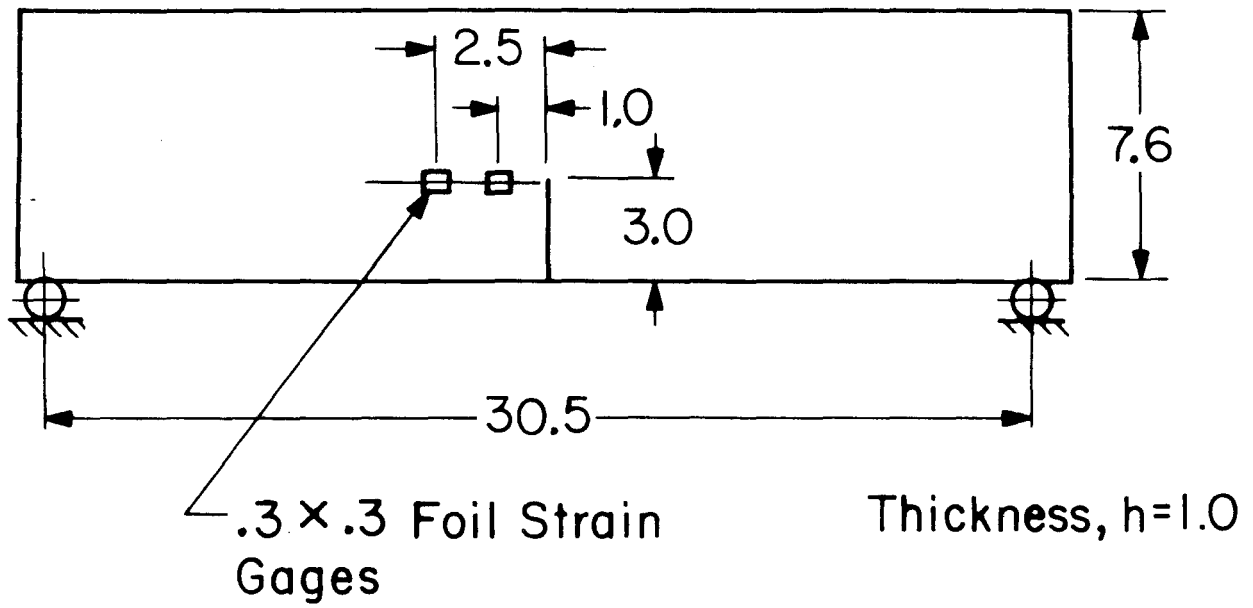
Specimen dimensions and geometry for specimens 67-71.
